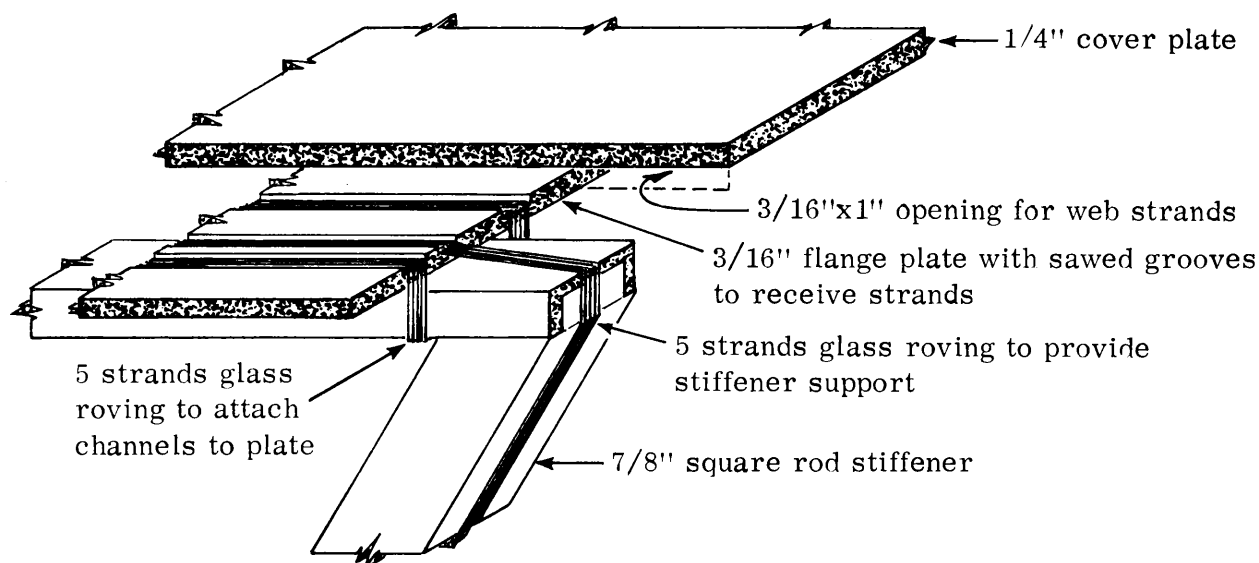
Top-flange assembly details of specimen TTG-5. Basic conversion unit: 1"=25.4mm.
